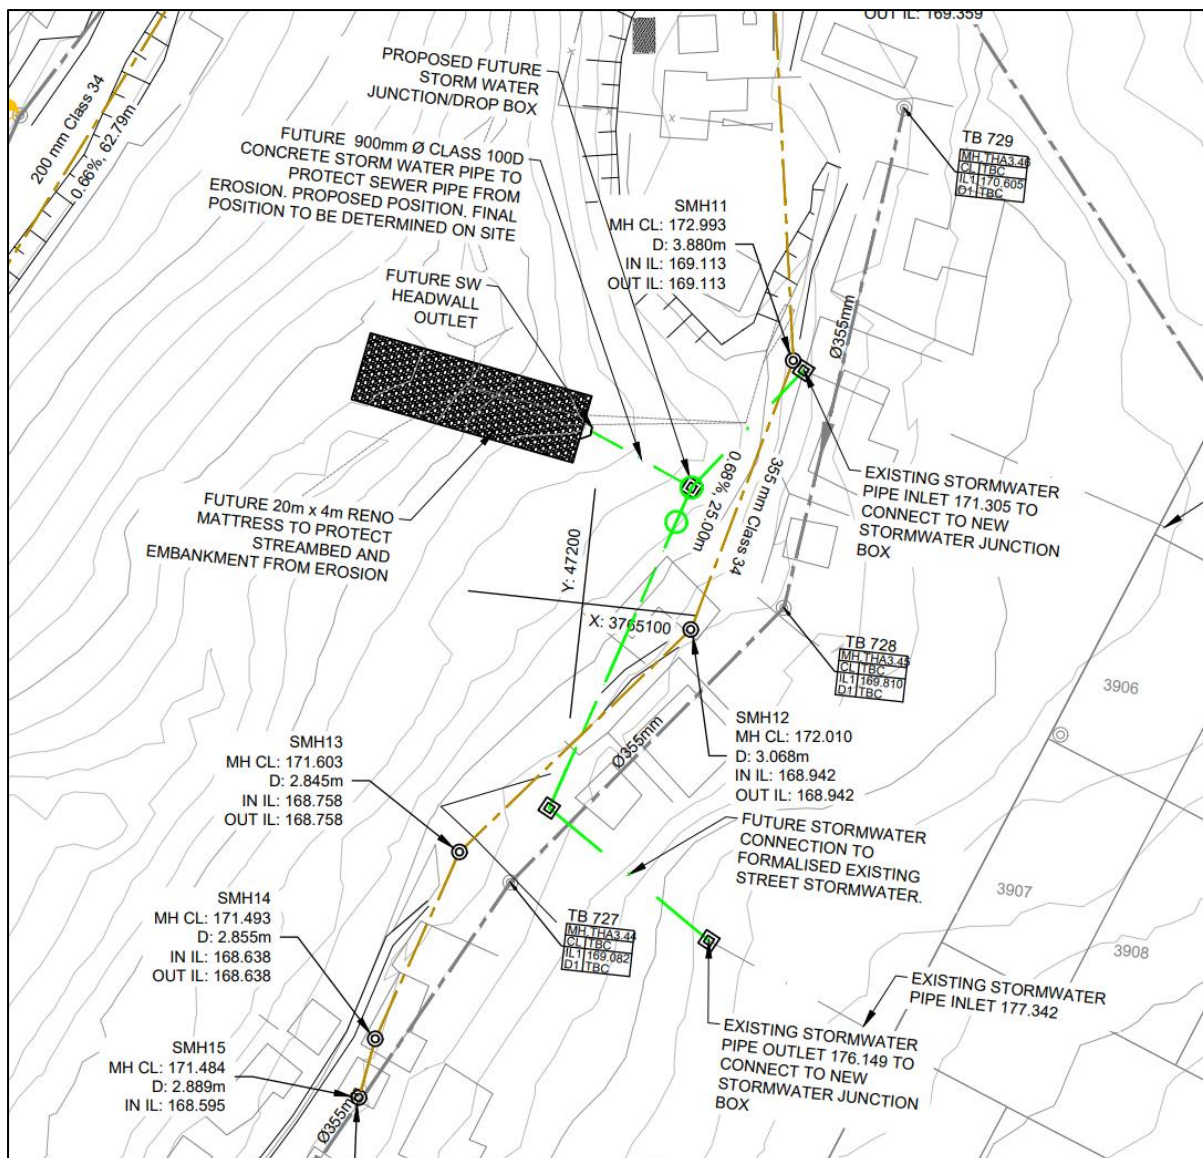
Schematic drawing of the proposed Reno mattress above the gabion wall to prevent erosion caused by blocked stormwater pipelines causing water to flow over the face of the gabion wall (Confluent Environmental, 2024).
